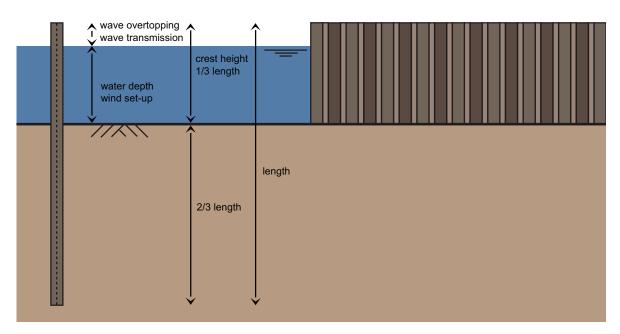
Cross-sectional View (left) and Side View (right) of Sheet Pile Breakwater
